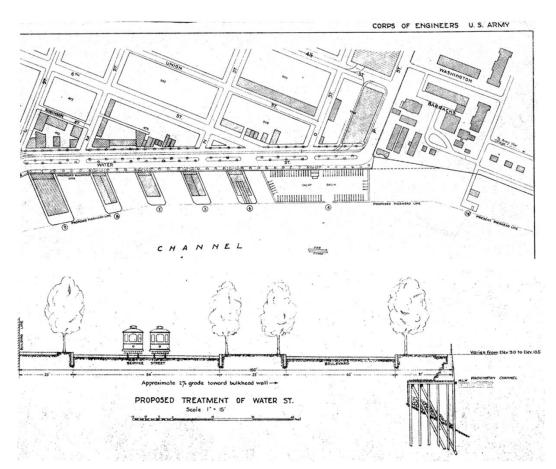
The 1925 Rivers and Harbors Act authorized the Army Corps of Engineers to prepare the first redevelopment plan for the southwest waterfront. The plan called for the elimination of existing wharfs and docks, in favor of uniformly oriented piers and level pierhead lines. The plan also called for the improvement of Water Street SW as a tree-lined boulevard with a median that separated a service street with streetcars from a waterfront boulevard. (Excerpts from "Proposed Development of Washington Channel Waterfront," ETIC WEPO 801 125486 [id27207], NCA, NPS)
